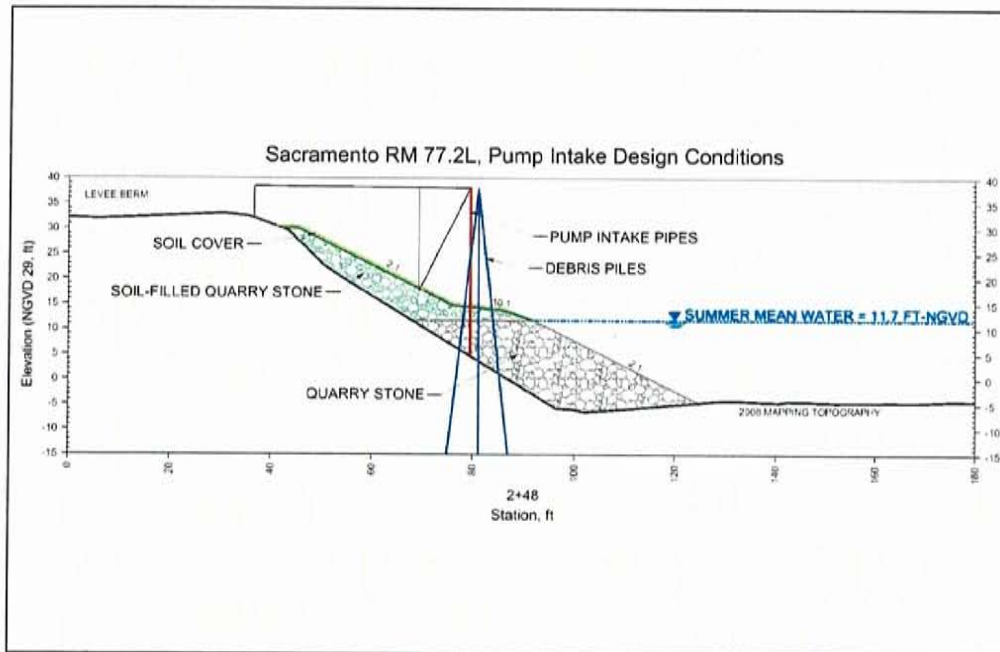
Design conditions cross section at SAC RM 77.2L at the pump structure location.
